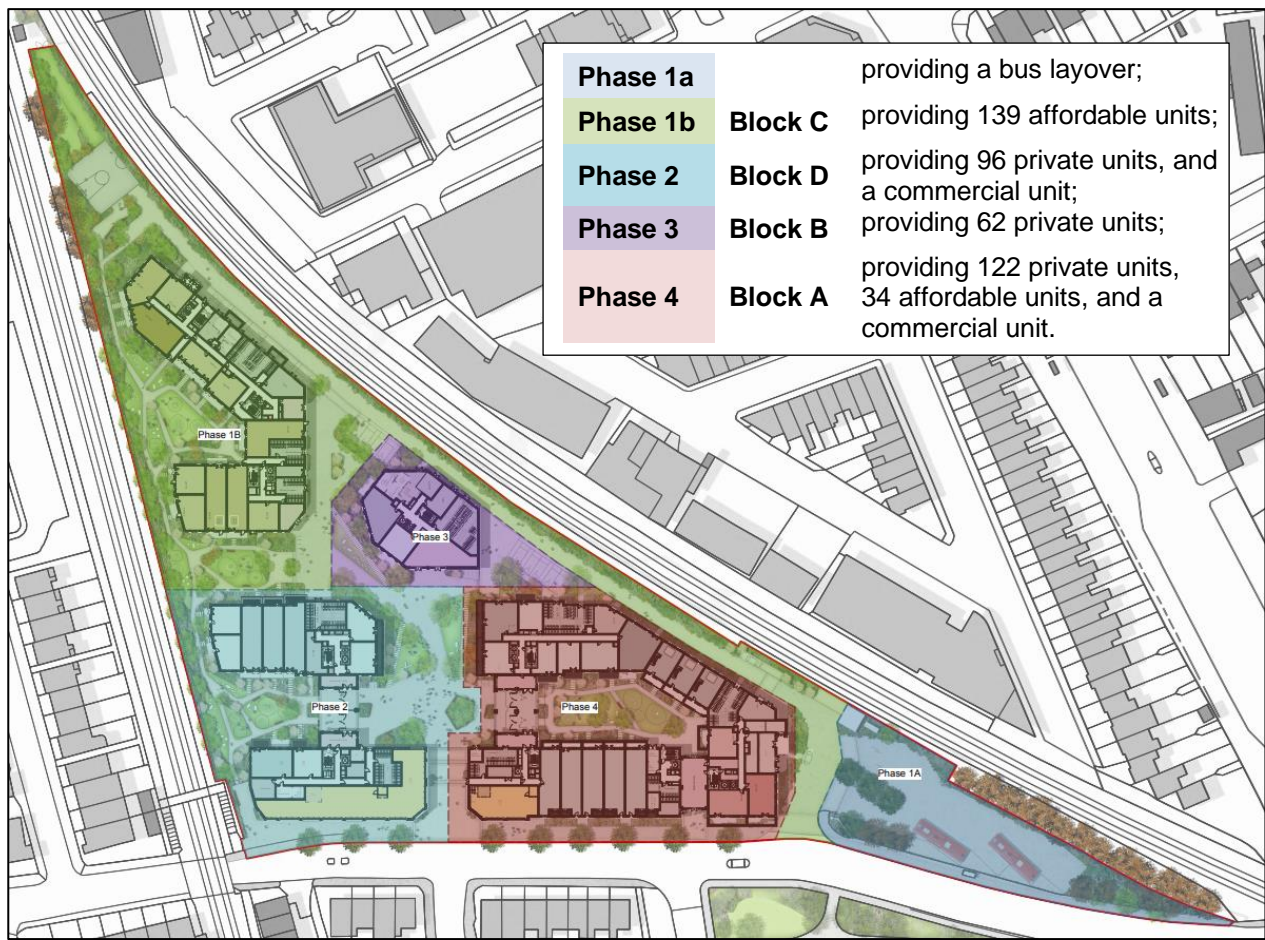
proposed phasing plan / layout with annotations and use of each building
